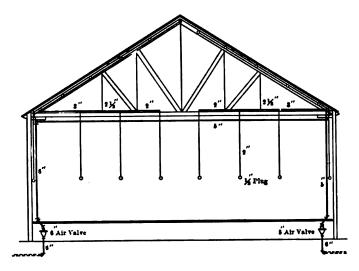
Section through North Albany Car House Showing Combination of Ceiling and Side Line Sprinklers.
